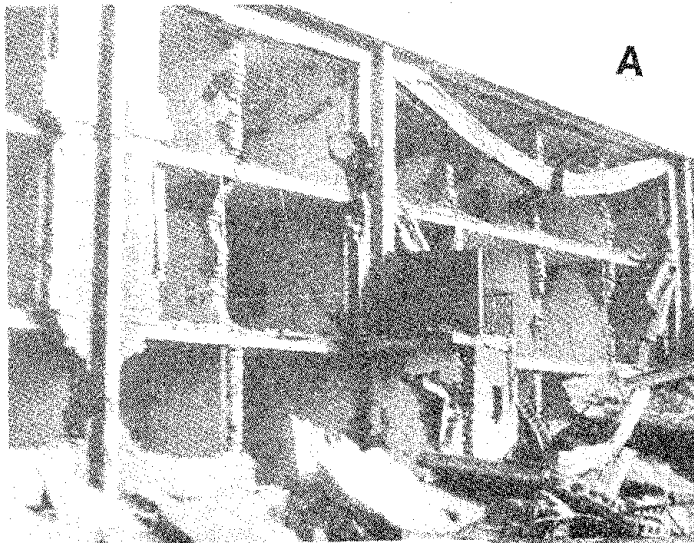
Damage to building having wall piers outside during the Tangshan earthquake
